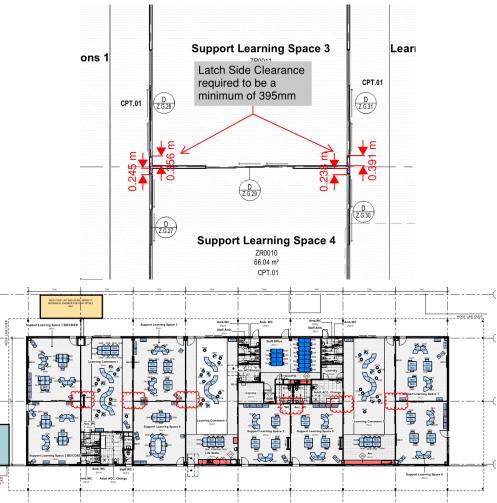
Block Z - Latch Side Clearances to Sliding Doors
